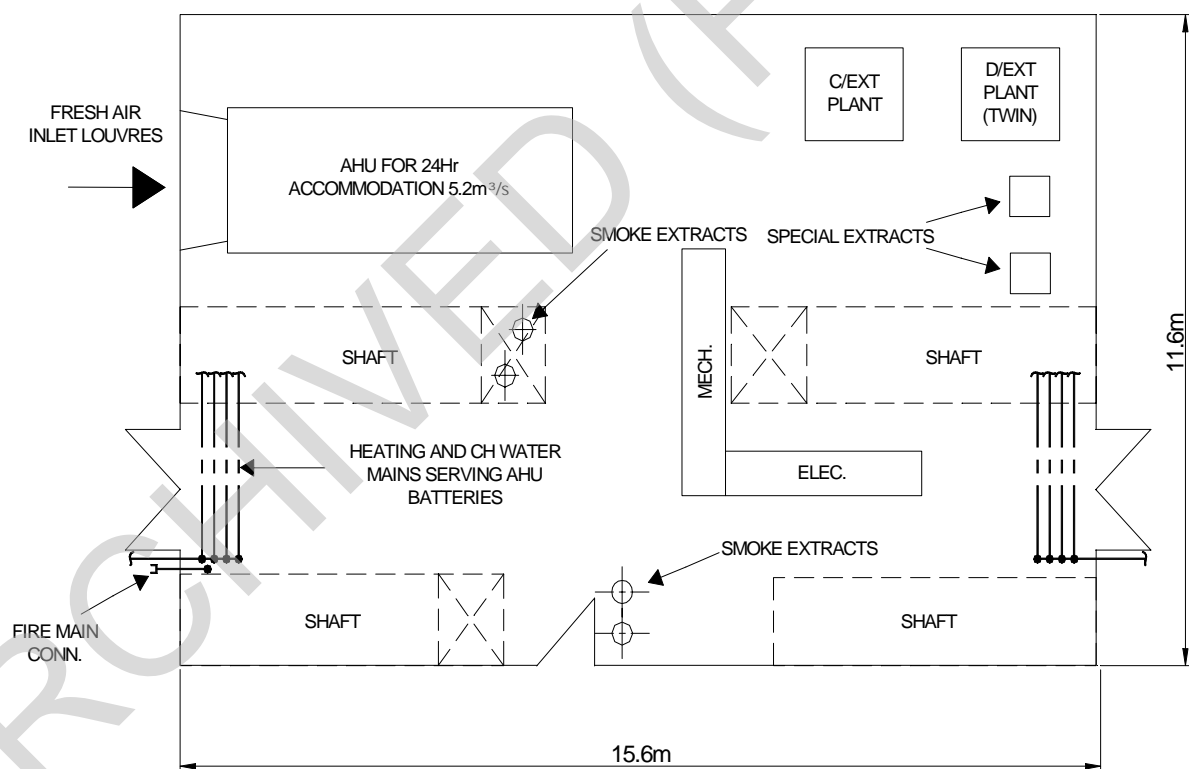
Arrangement 'A' of plantroom 7 serving a combination of 24 hr operating theatres (4) and 9-5 accommodation
